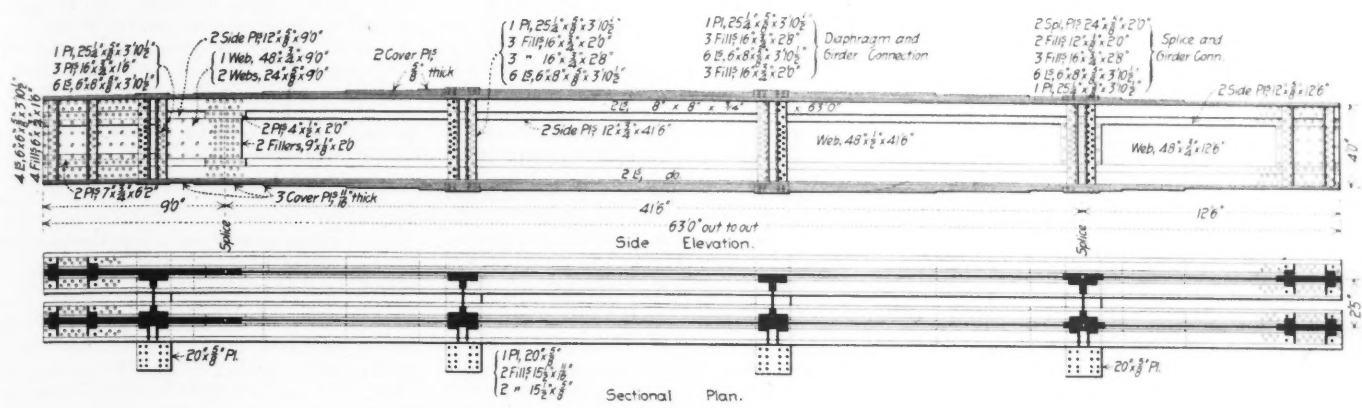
BOX GIRDERS SUPPORTING ROOF OF BY-PASS OVER CABLE RAILWAY TUNNEL.
